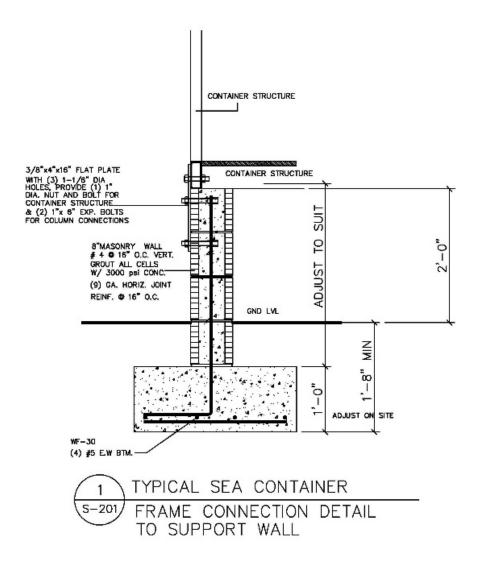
A. Details of mobile rearing unit (MRU) anchoring system. End wall feature (A) is a footing supporting a filled concrete block wall running the width of the MRU at each end of the MRU.
